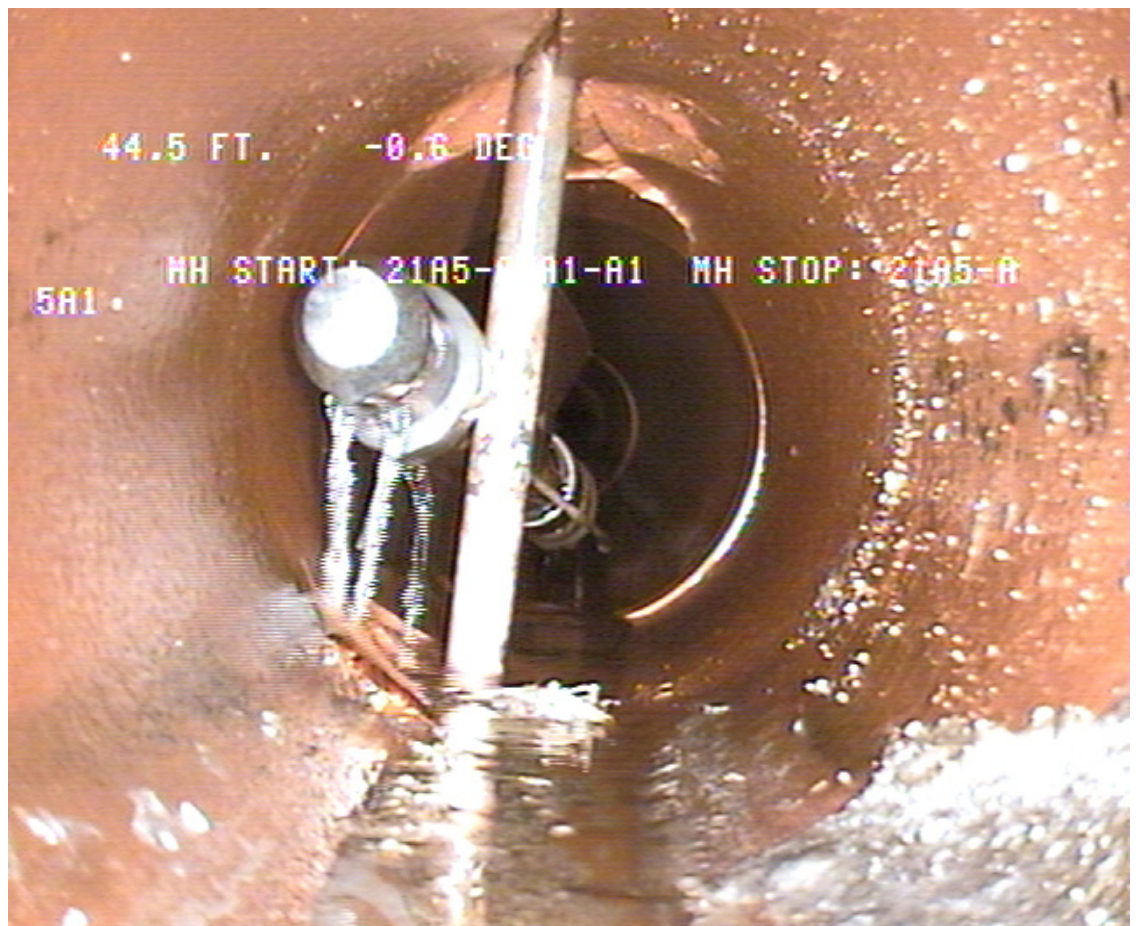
depicts a deep concrete mounting base for a parking lot light standard that was constructed directly over a 6" clay sewer main pipe. The background topographic features on the design site plan showed the existing sewer manholes, but no connecting mains were depicted. In multi-discipline project designs, such omissions can result in field conflict and costly change orders. The sewer main pipe was crushed, resulting in a major sewage backup.
